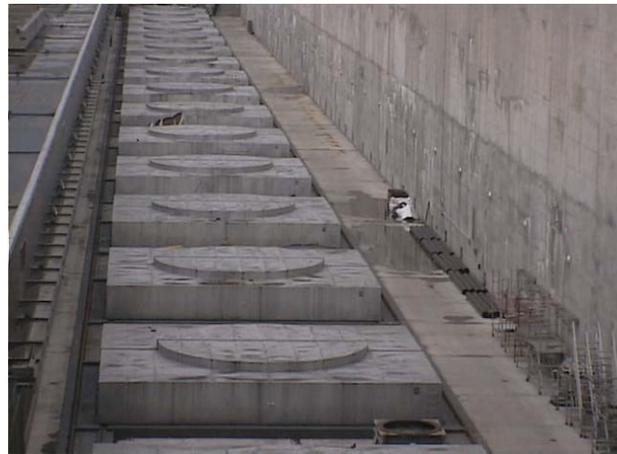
New generator roof deck roadway, laydown areas and walkway
